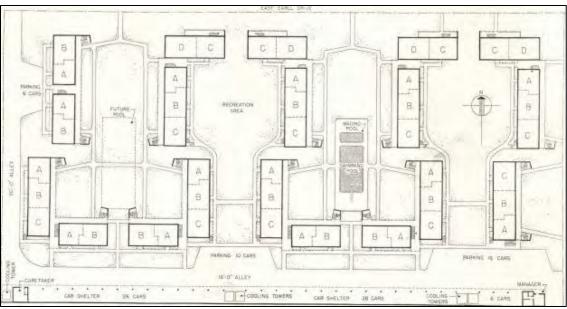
Plot plan for the Country Club Apartments, showing building layout, parking, sidewalks, and "future" pool locations (Image reprinted from *Progressive Architecture* 1950).
